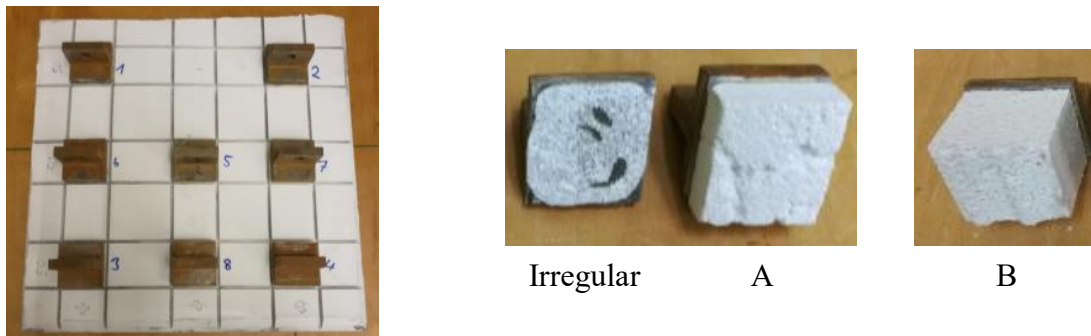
Testing of adhesion to the substrate: Glued tension plates on specimen surface and possible failure modes (from left to right): (Irregular) failure along glued Surface, (B) specimen failure, (A) adhesion failure.
